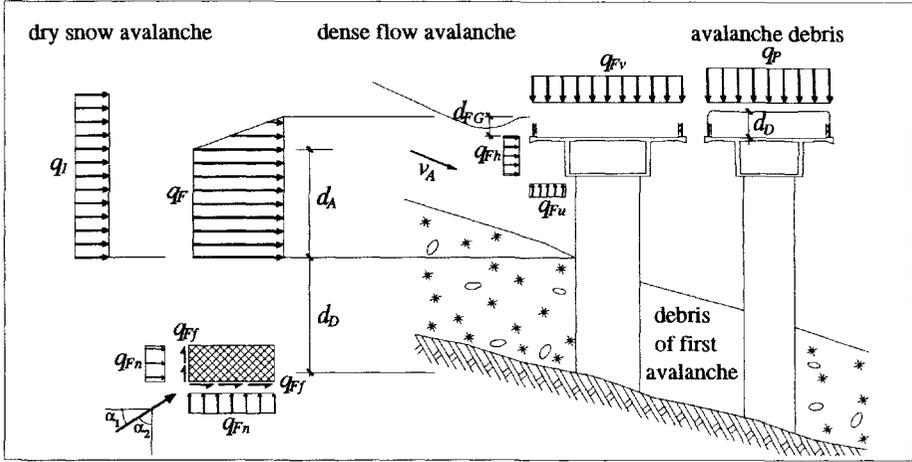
Actions on piers and girders of the Reuss bridges A2 Wattingen, extreme hazard scenario
